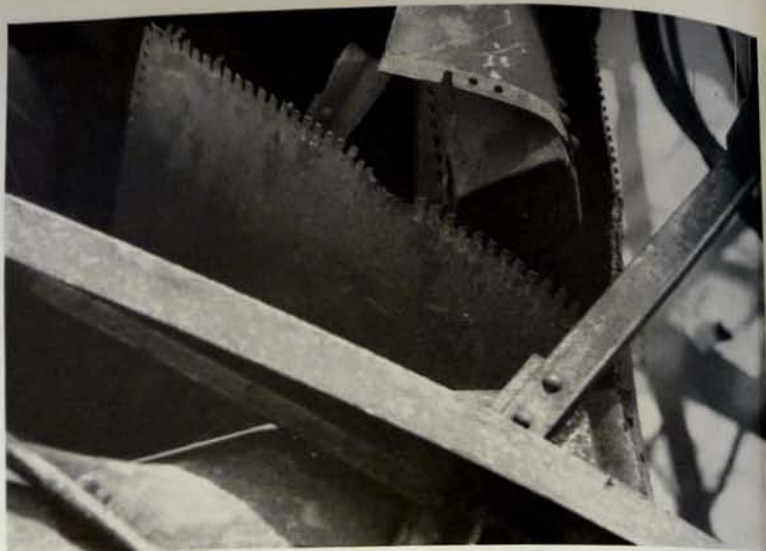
3,000 feet from GZ. View of sheared rivet seams on gas holder, Ohashi Gas Works.
